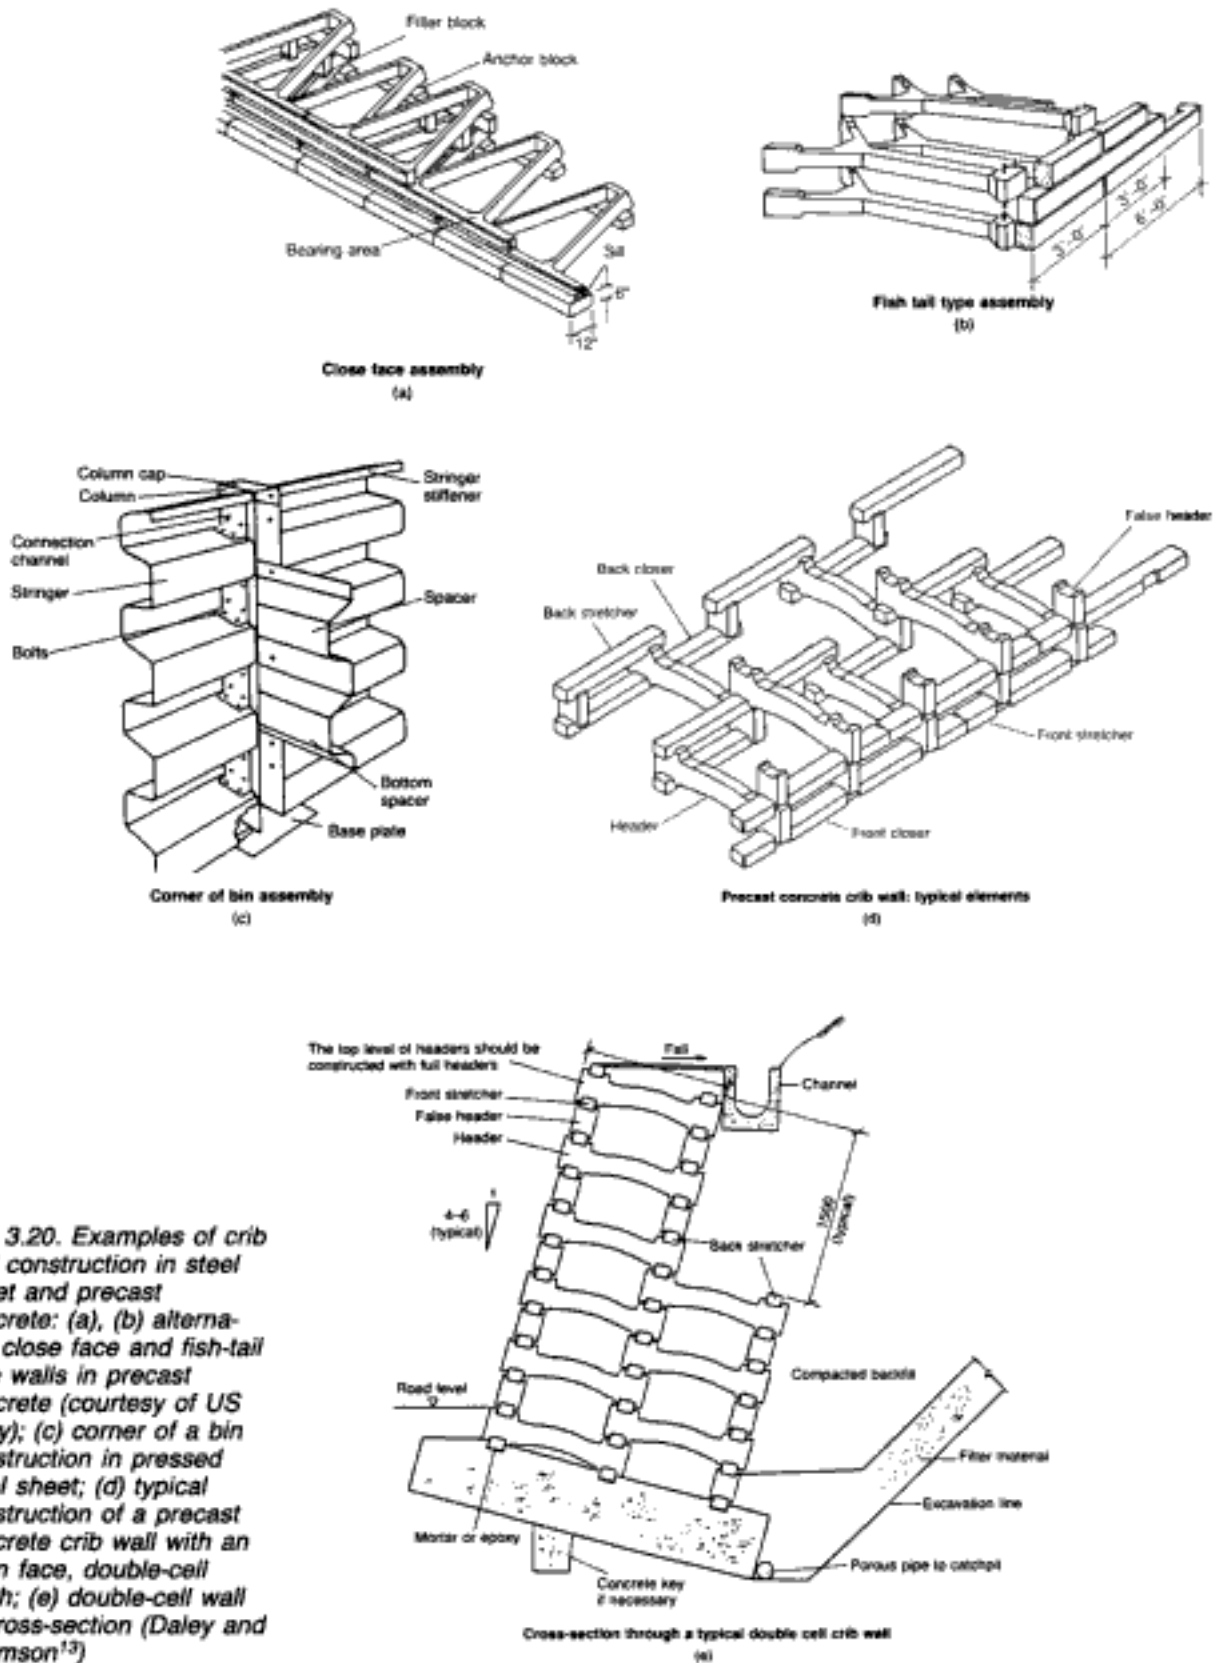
Examples of crib wall construction in steel sheet and precast concrete: (a), (b) alternative close face and fish-tail type walls in precast concrete (courtesy of US Navy); (c) corner of a bin construction in pressed steel sheet; (d) typical construction of a precast concrete crib wall with an open face, double-cell width; (e) double-cell wall in cross-section (Daley and Thomson¹³)
